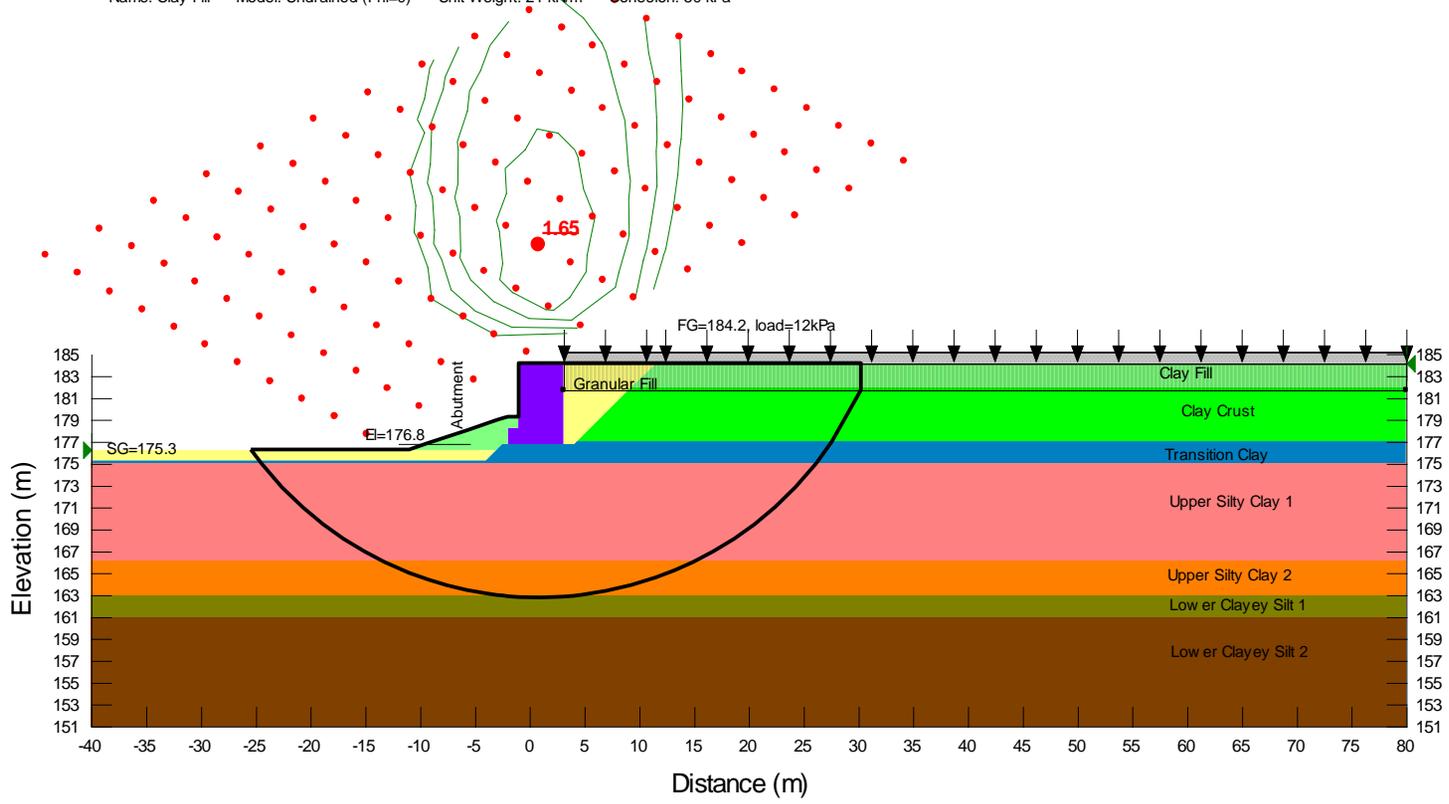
Slope Stability Result – West Abutment – End of Construction Loading (Undrained properties)
